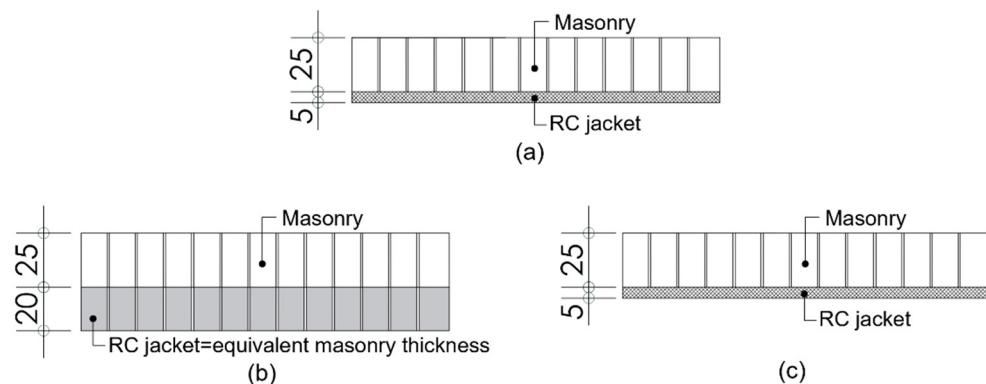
Numerical models for simulating RC jacketing: (a) actual wall section; (b) equivalent masonry section according to PTN-S, and (c) numerical model according to EC8-3.
